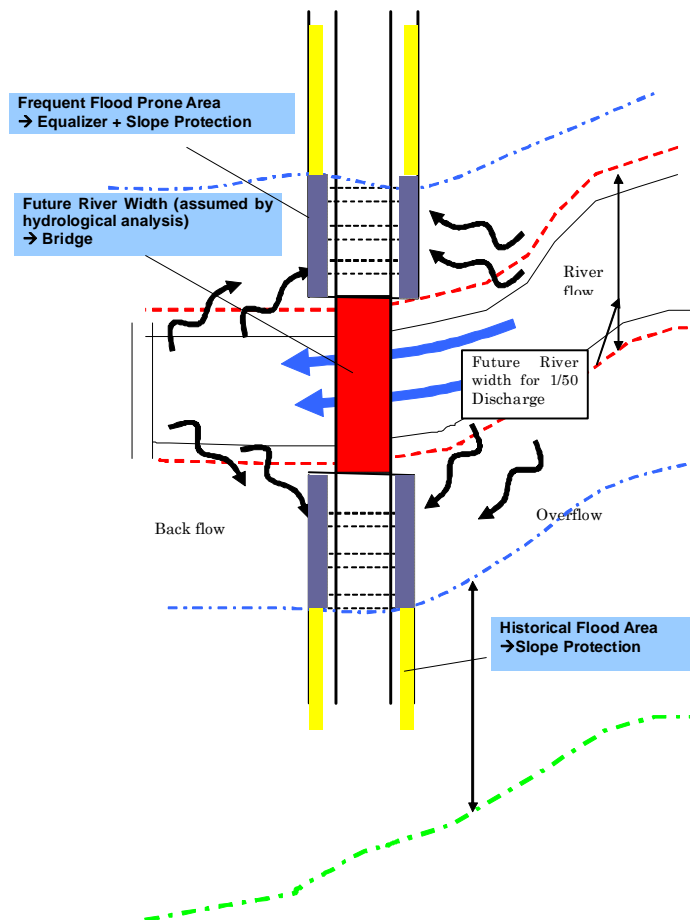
STRUCTURAL DESIGN AT FLOOD PRONE AREA
